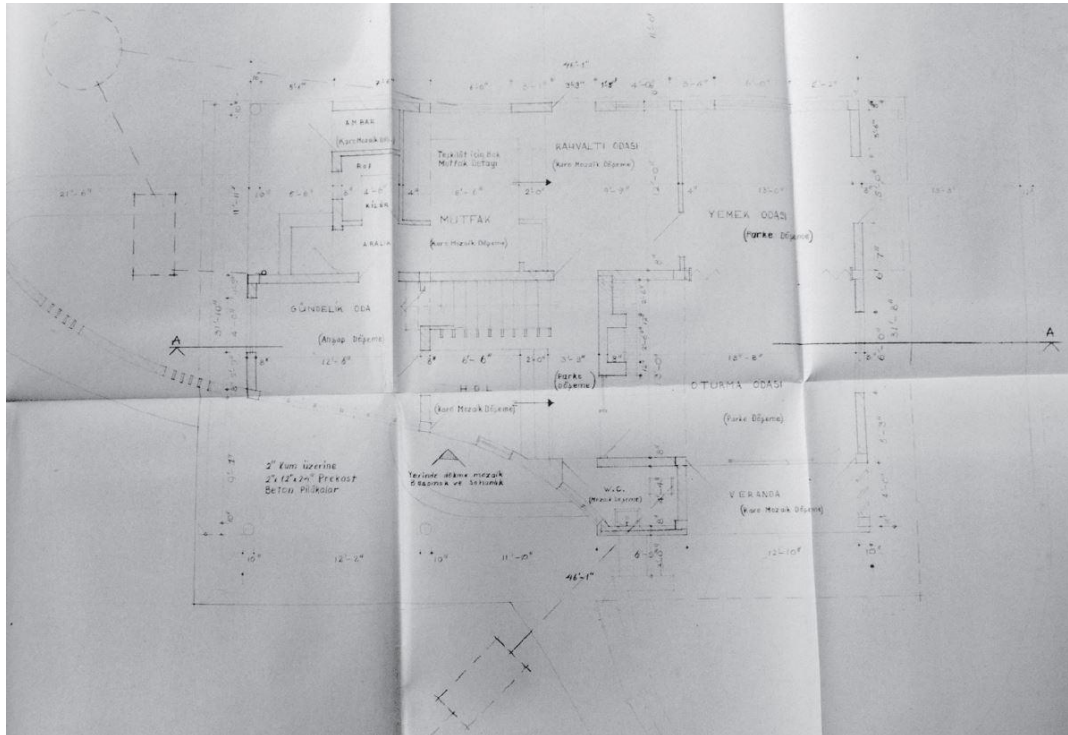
The ground floor of Ertoğrul Güven House (Yavuz, E., 2021, p:34).
